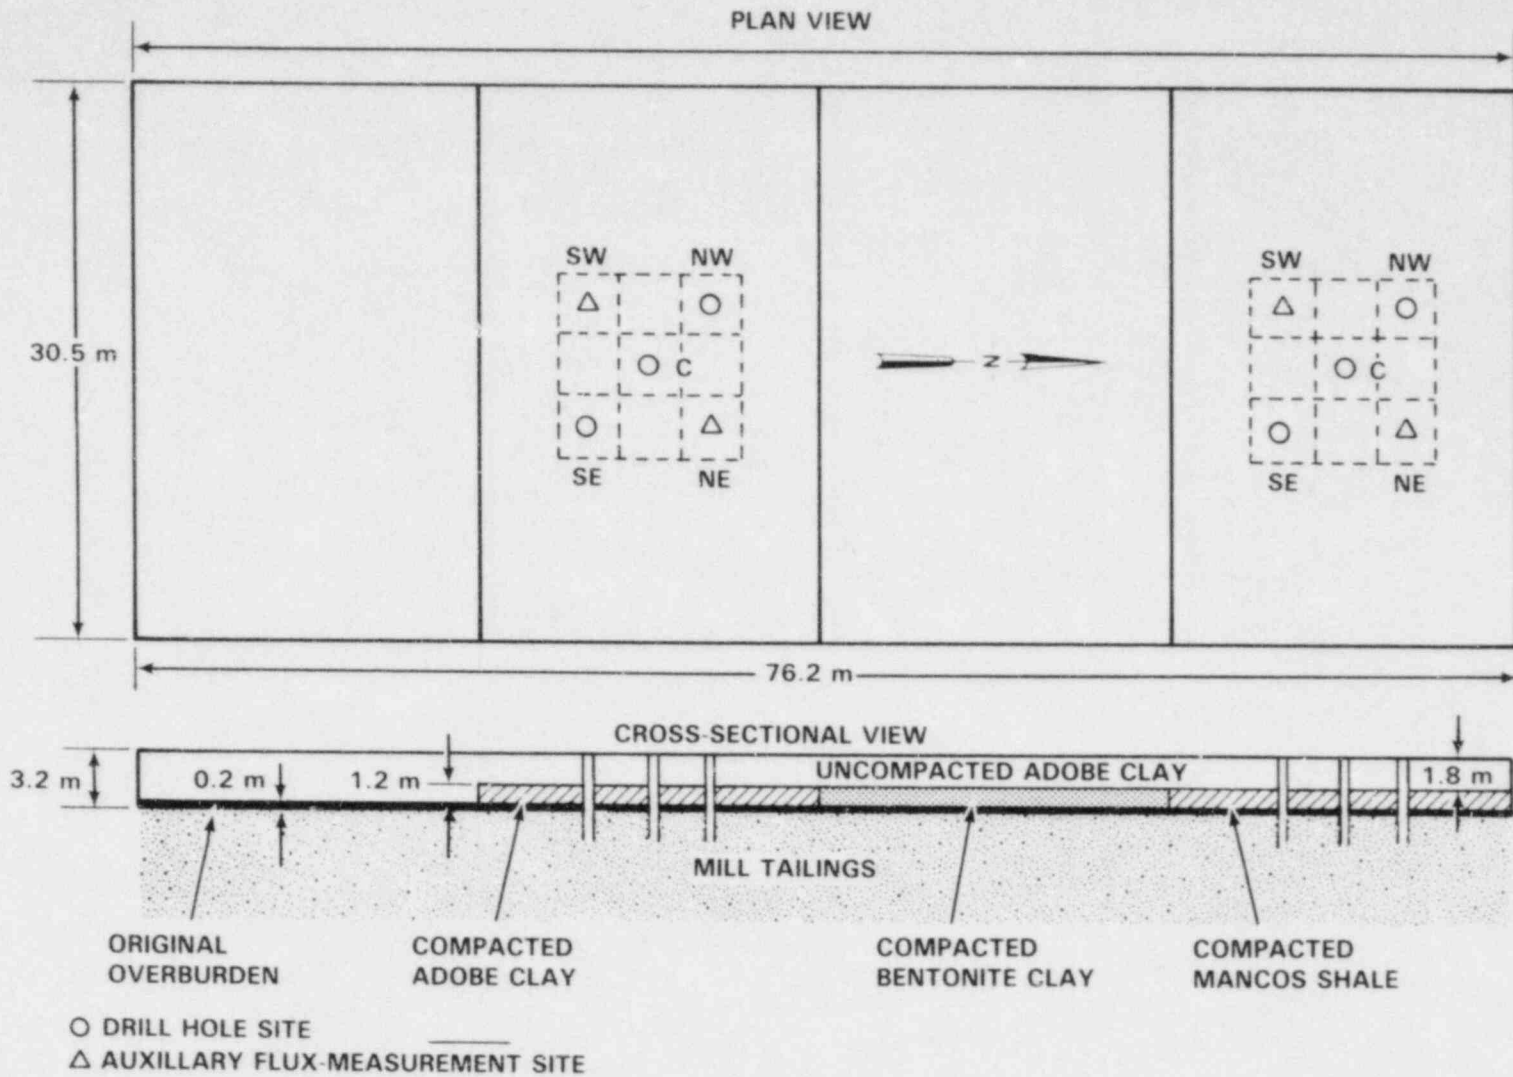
Plan and Cross-Sectional Views of Field Sites
